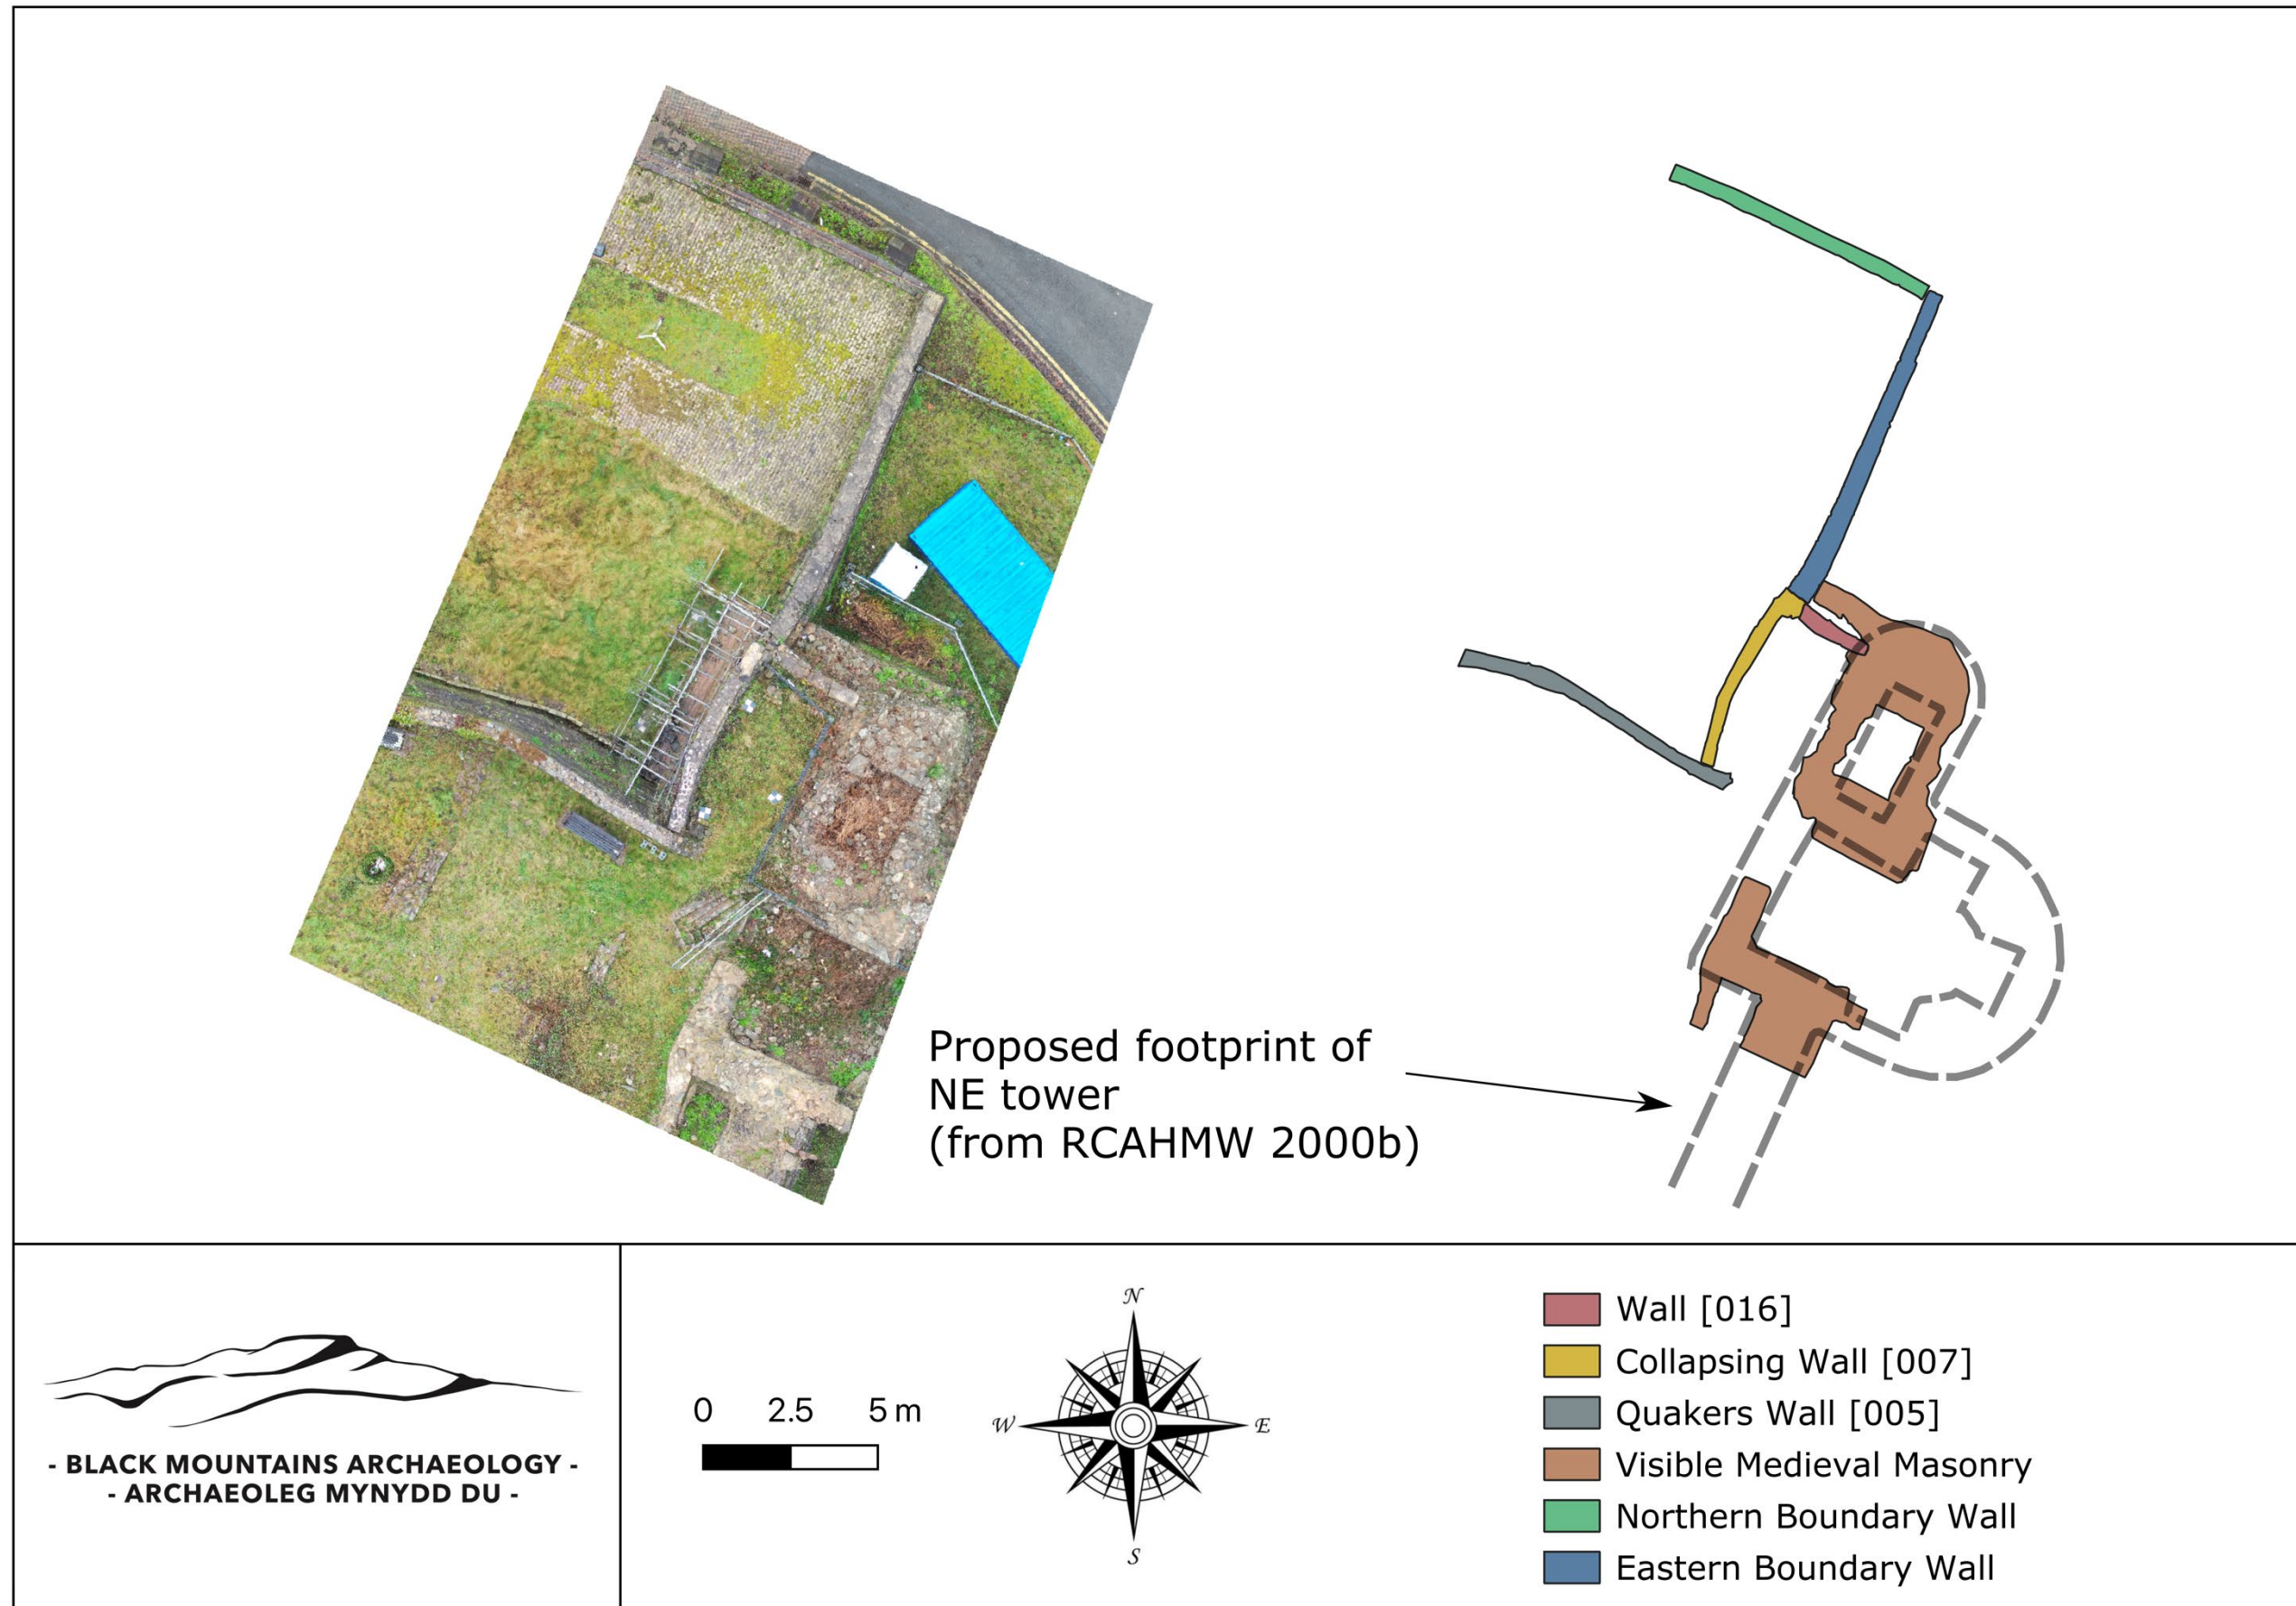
Pre-excitation plan of collapsing wall, Quakers Wall and features associated with the northeast tower of Neath Castle with photogrammetric still (left) and phased schematic (right)
